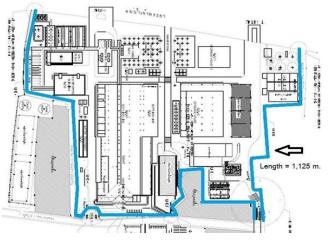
Flood wall protection plan or Pathum Thani brewery project
